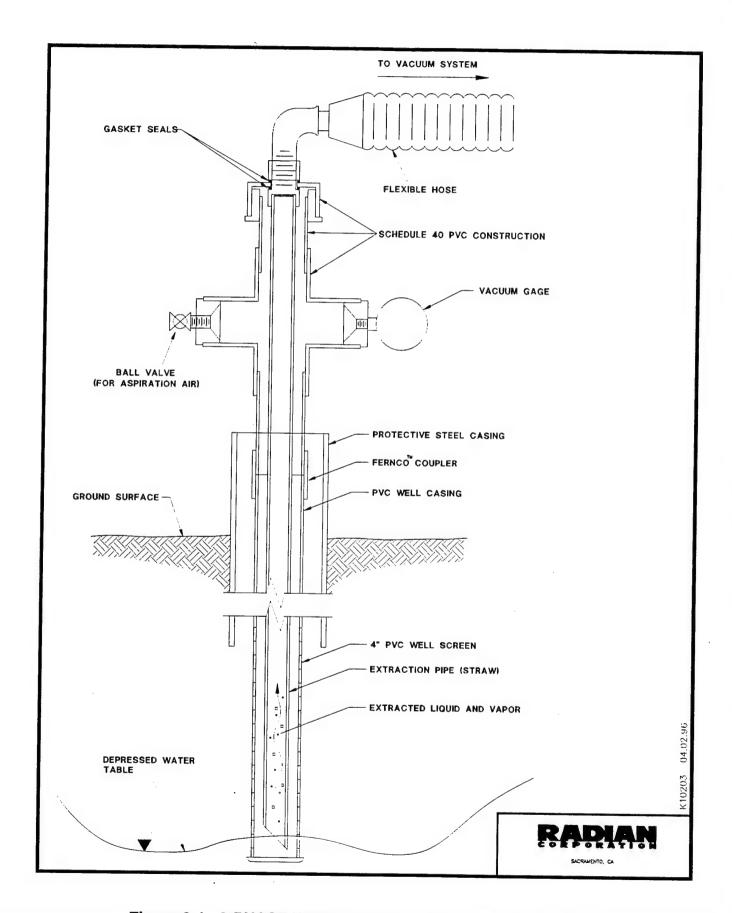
2-PHASE Wellhead Assembly and Extraction Well
